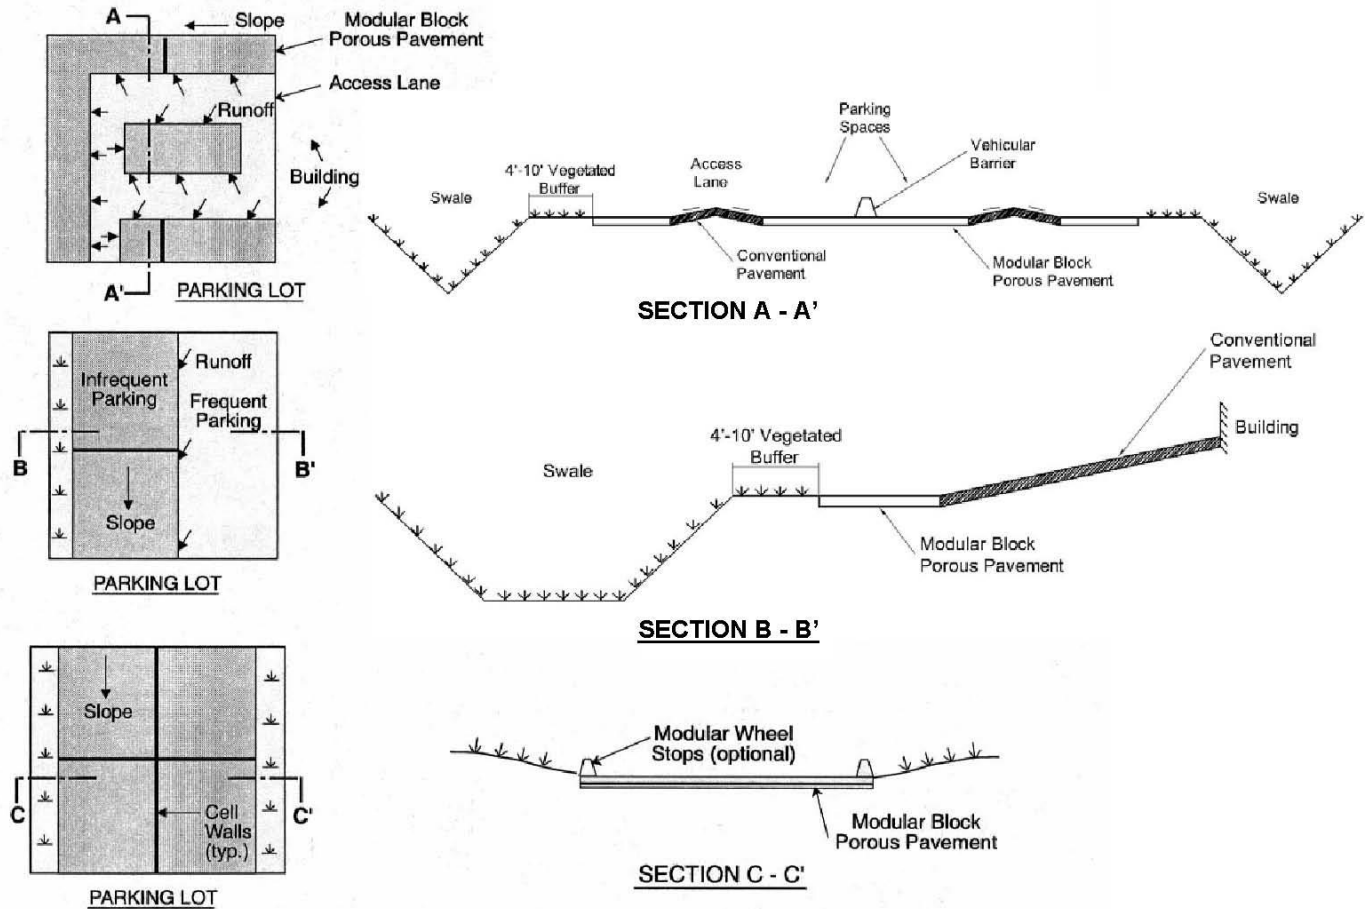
Typical Modular Porous Paver System Applications
